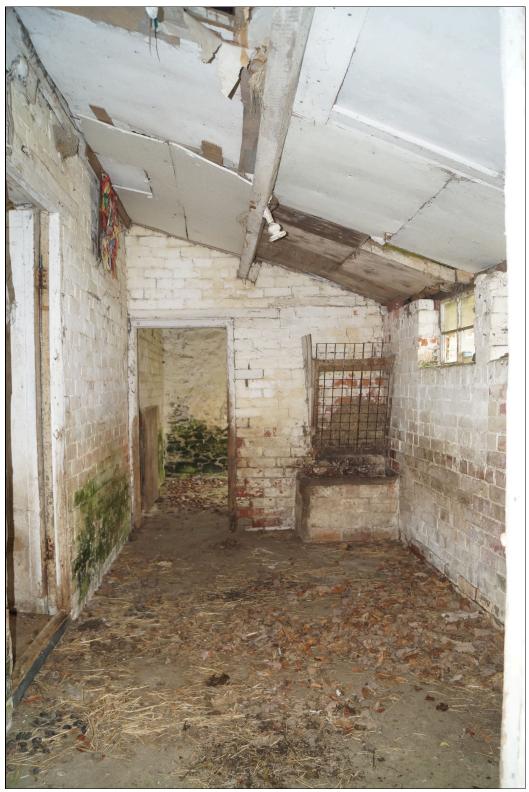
GGN2019_009 – A view of the inside of the "stable". The feeder to the right of centre has been added in after the building had ceased being used as a glasshouse and potting shed and the stable had been created inside its northern section. Looking west.
